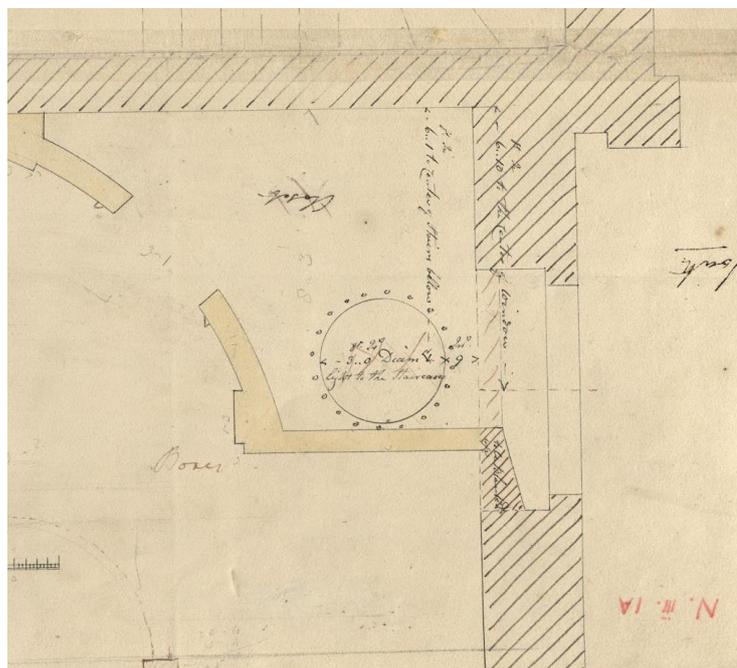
Detail of architectural plan showing the window in the southernmost box to be blanked or filled (WY/N/3/1a).
